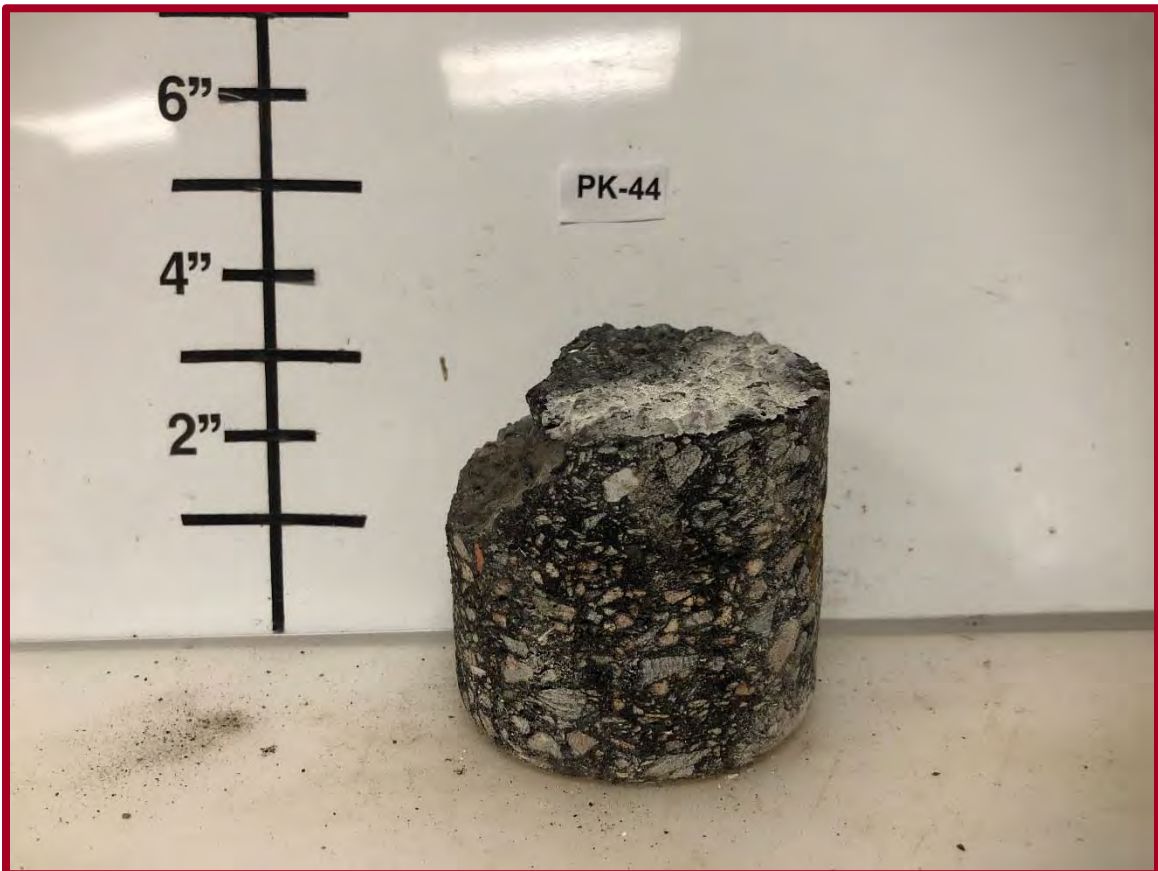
PHOTOGRAPH OF PAVEMENT CORE PK-44
